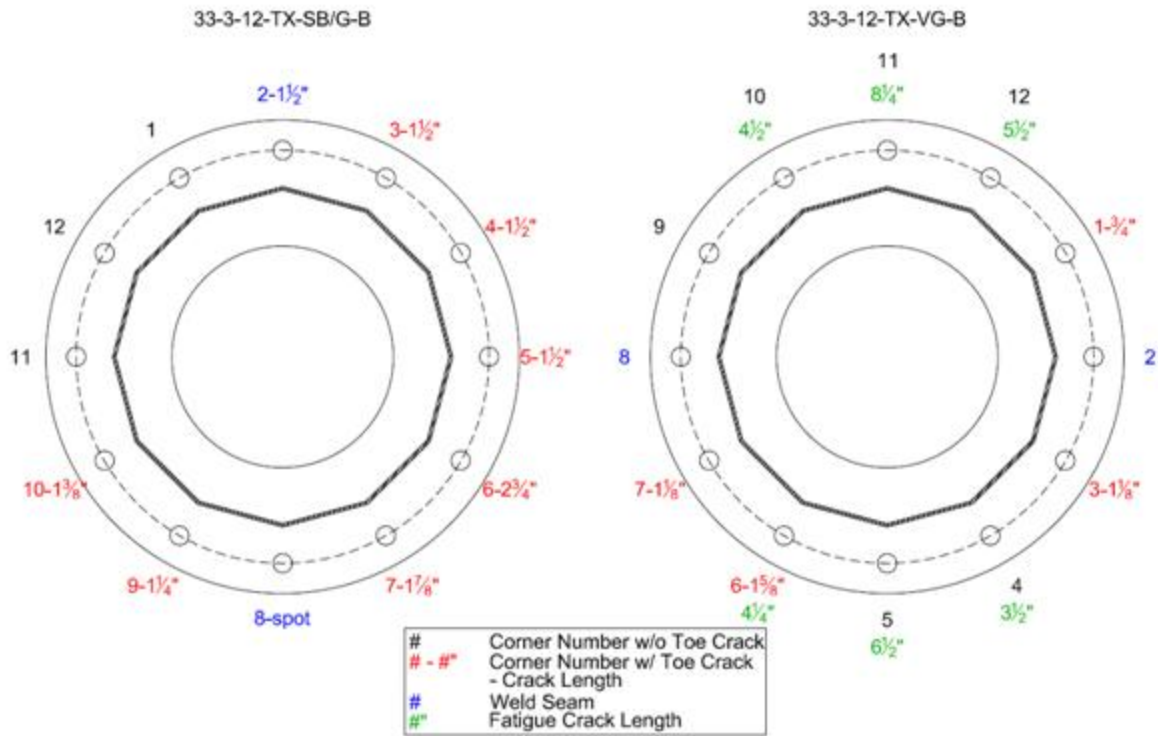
Cracks in Weld Repair Specimens Prior to Repair
